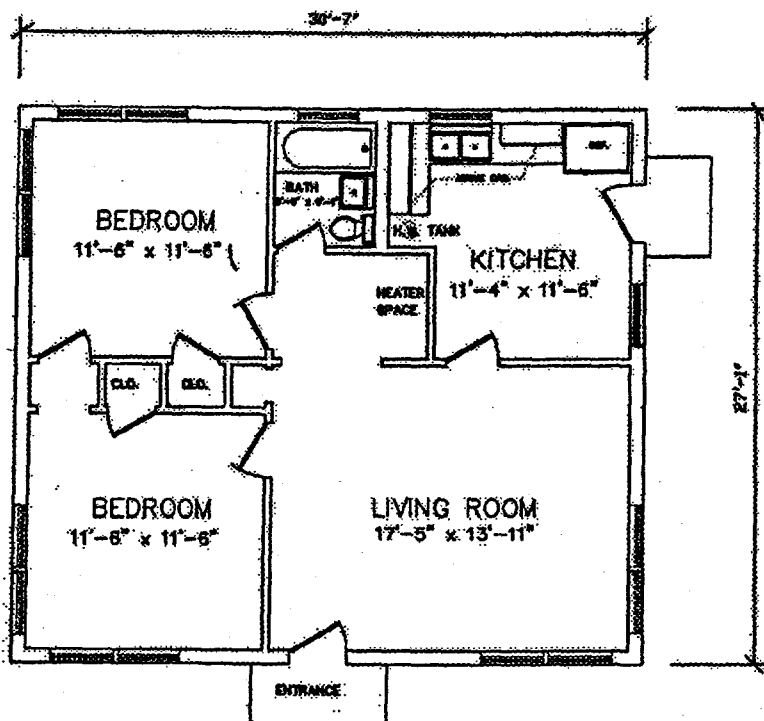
Floor plan for typical "Tuskegee Concrete Block" House.
